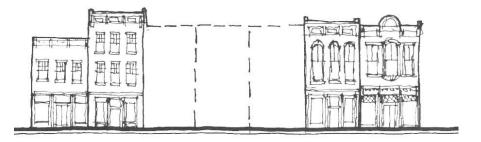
Width should be a series of 25 foot bays. Height should be within 25%, plus or minus of adjacent buildings.
